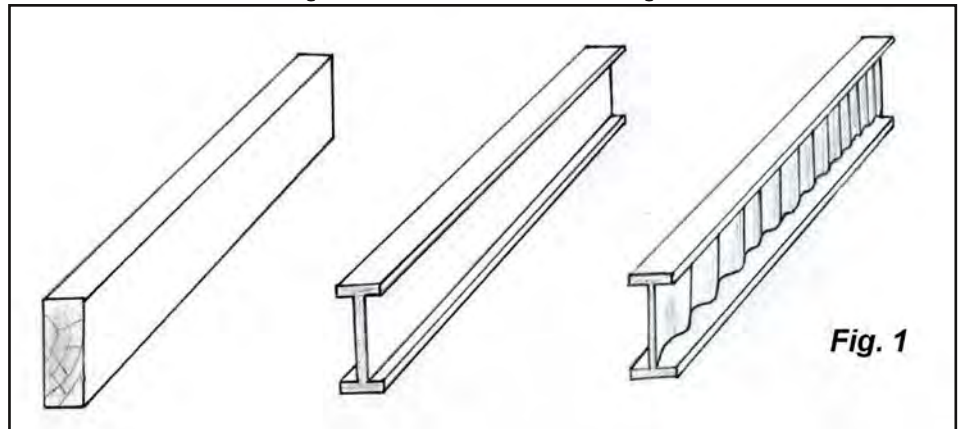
Timber floor joist, steel I-beam, and corrugated steel/timber chord joist. (illustration by Graeme Plaw)
